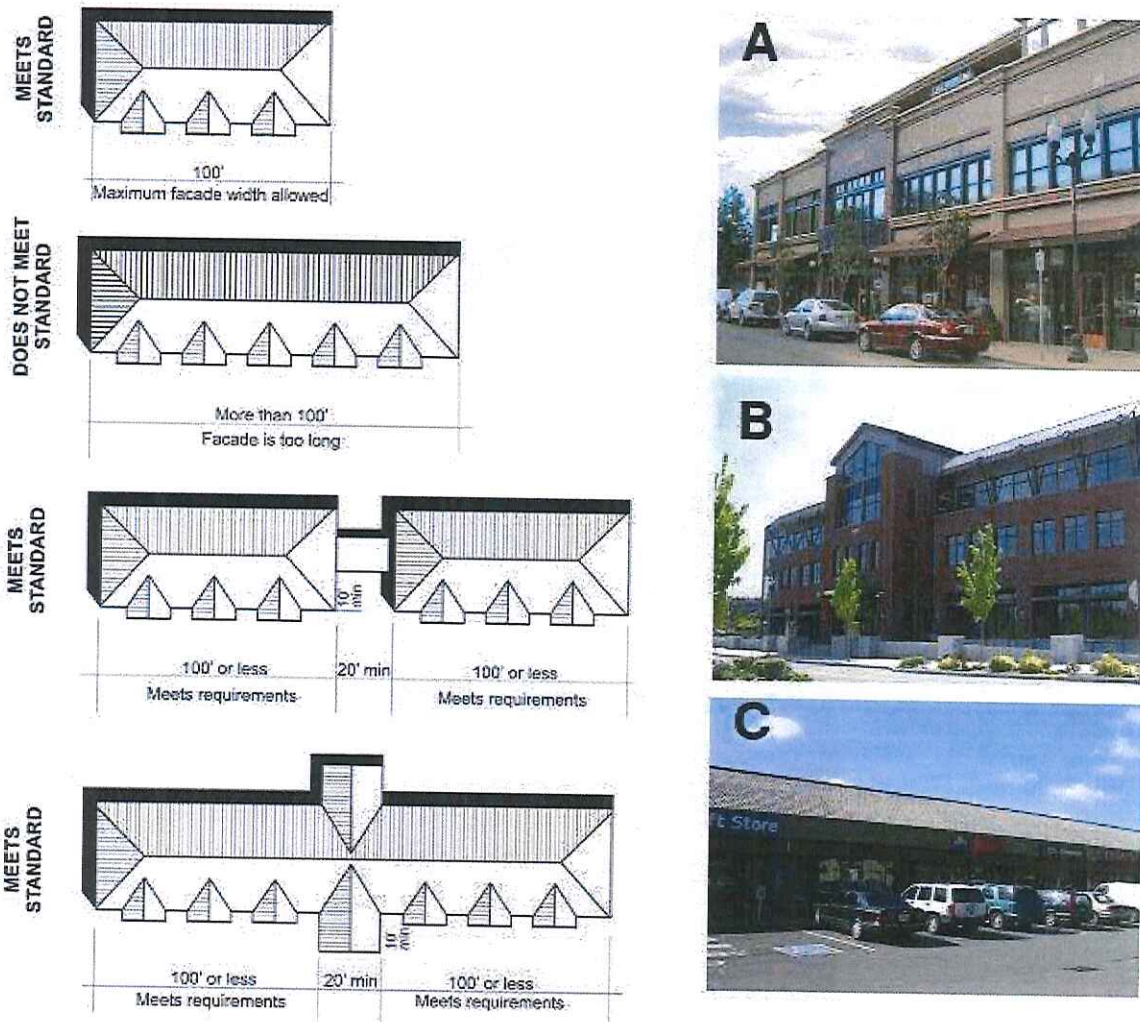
Maximum facade width standards and good/bad examples. Photo example A successfully uses a change in building materials, roofline, and window fenestration. Photo example B, while showing a building somewhat large for Eatonville, shows how a combination of facade and roofline modulation helps to break down the scale of the building and add visual interest. Photo example C does not include any of the optional design elements and thus would not meet the maximum facade width requirements.
